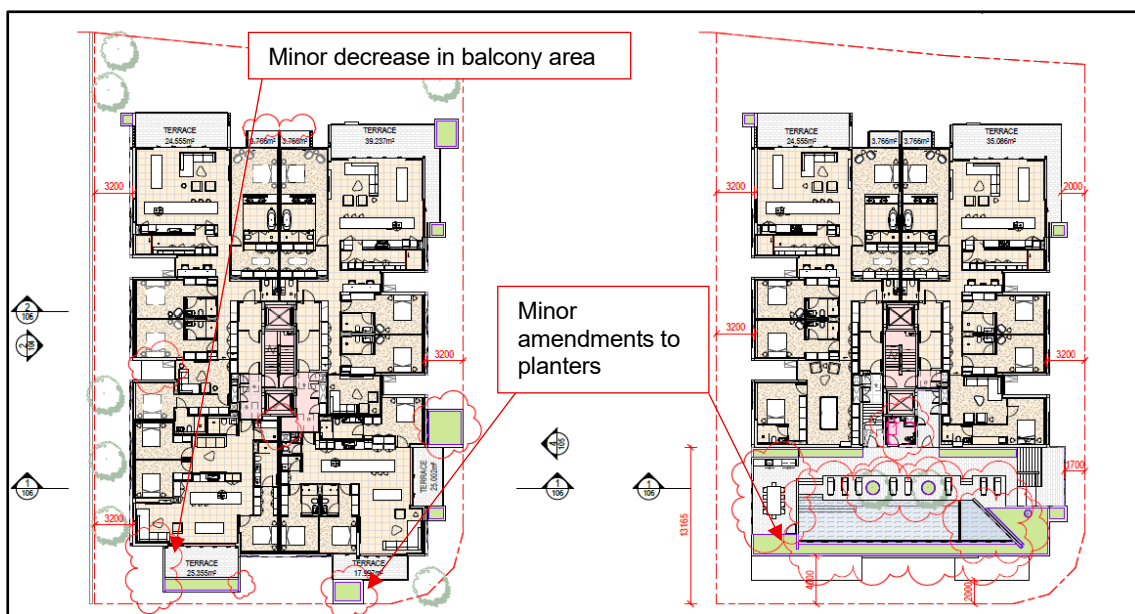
Proposed Floor Plans for Levels 2, 3 and 4 (Source: MODE)
